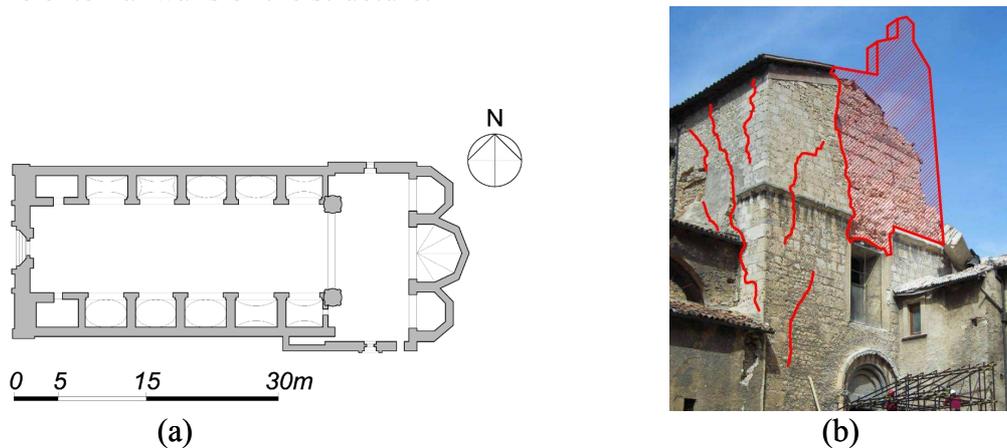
St. Giusta church: plan (a); damage at transept (b)
